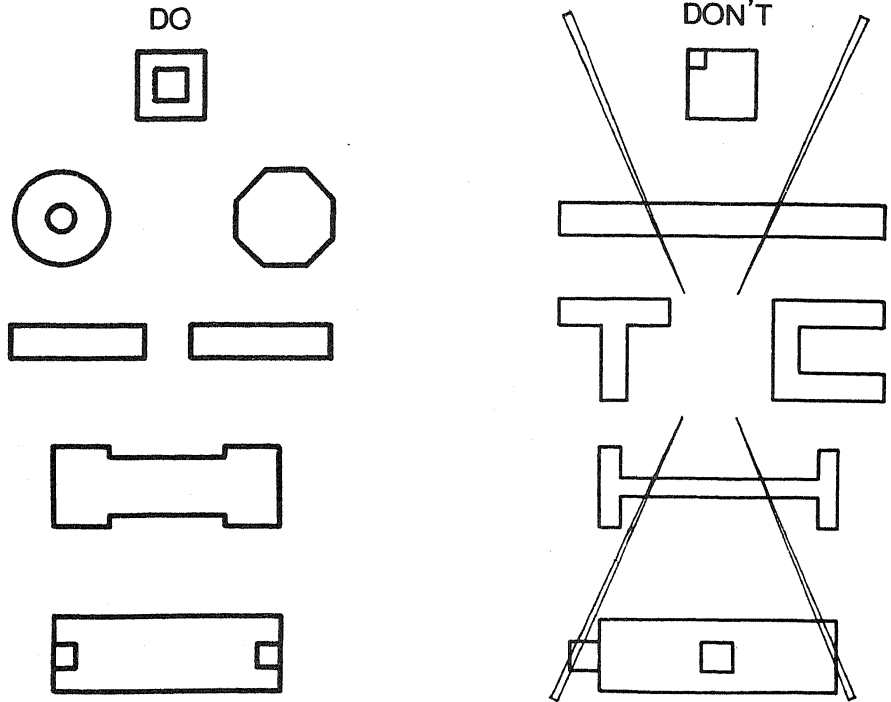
SIMPLE RULES FOR PLAN LAYOUTS OF ASEISMIC BUILDINGS
